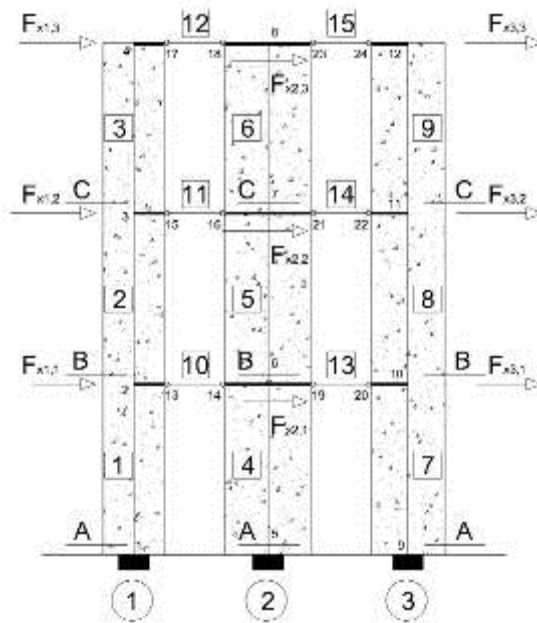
Wall model with transverse of nothing flexural stiffness and efficient floor beams.
